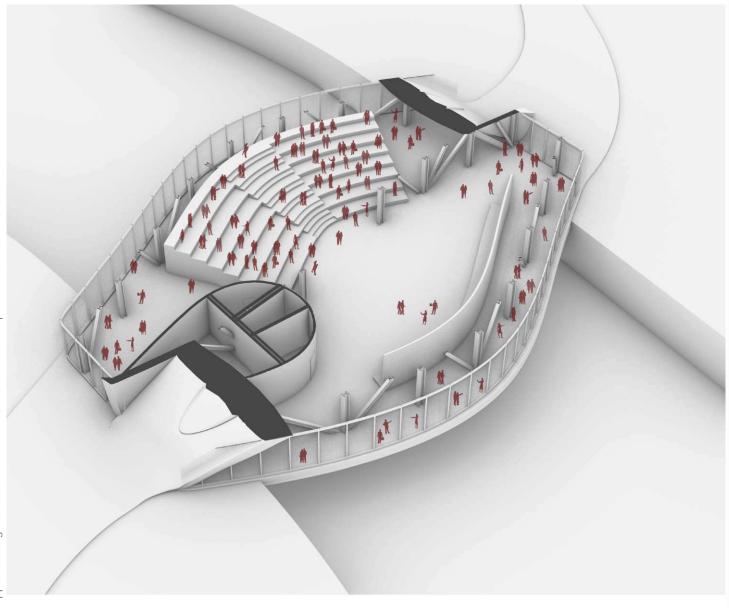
3d Axo - Building is used as a theater and for movie screenings
